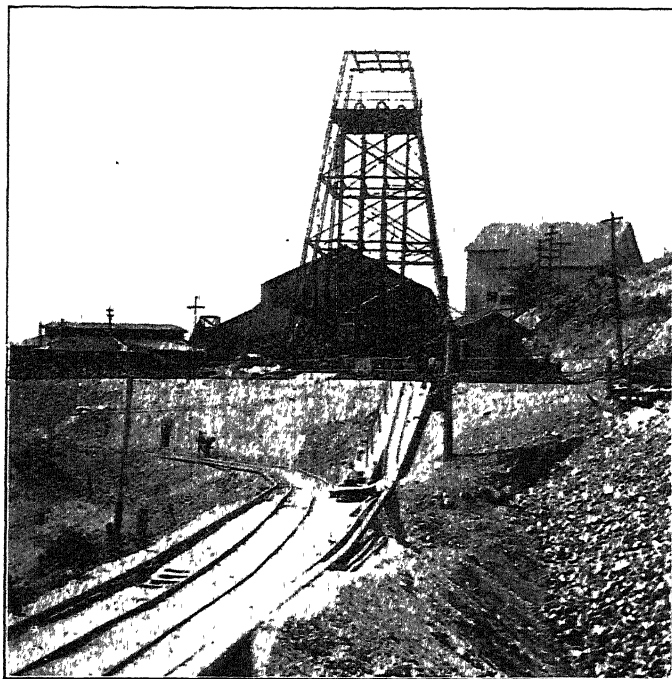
ESPERANZA SHAFT HEAD-FRAME WITH COMPRESSOR HOUSE AND HOIST HOUSE IN BACKGROUND.
